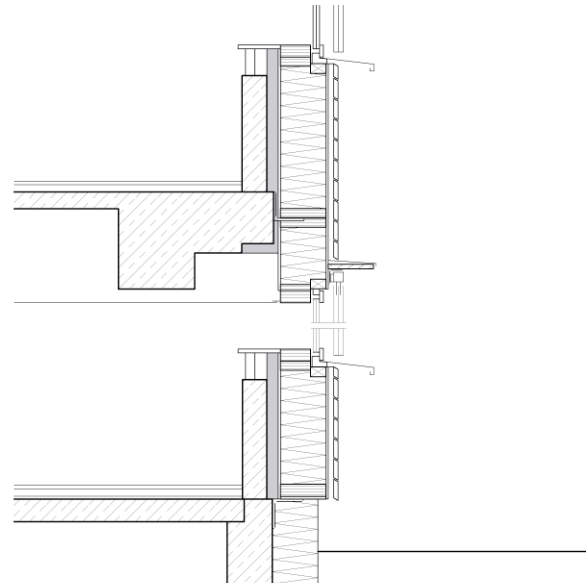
Section through existing concrete structure (left) and a new, prefabricated TES Energy Façade element. Adaption layer fills the gap (grey).
